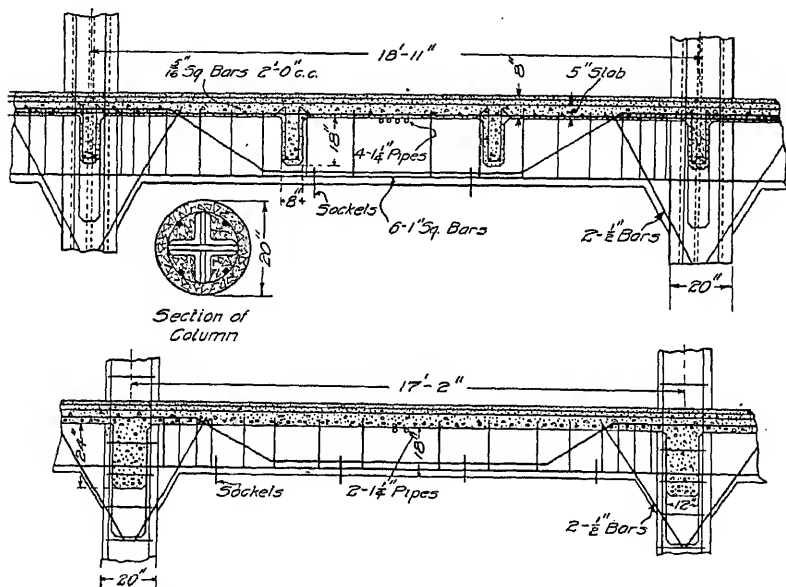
Details of Beams and Girders for Buck Building, Philadelphia, Pennsylvania
